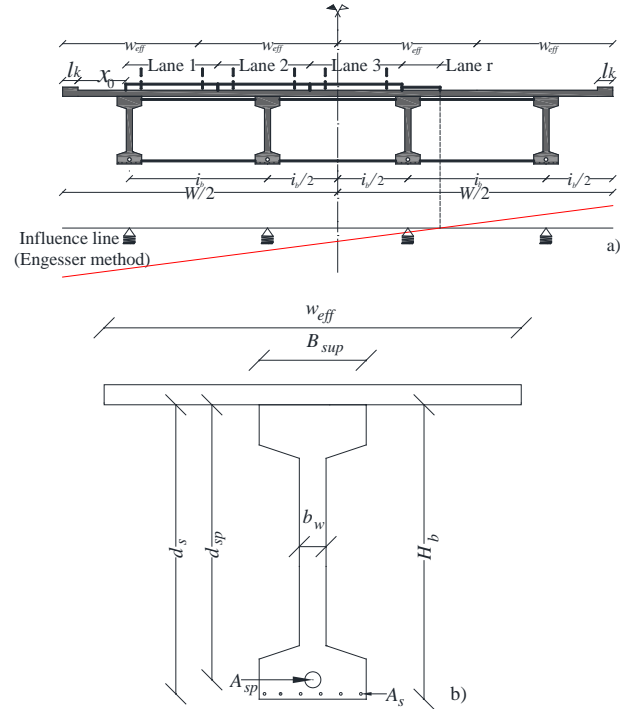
(a) Cross section of typical PC bridge deck with traffic load lanes (first lane at x_0 from kerb) and (b) longitudinal girder cross section.
